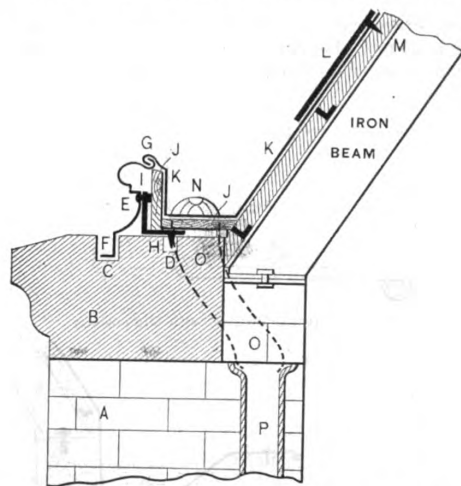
Method of Fastening Molding to Stone Work, Forming Gutter and Connecting Tube.
